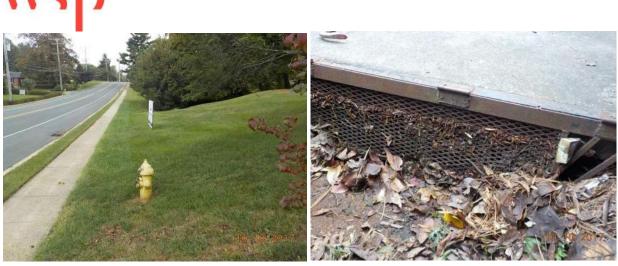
Looking Southwest adjacent to E Macphail Road at ground above underground facility (left); Looking at clogged inflow point located in parking lot (right)
